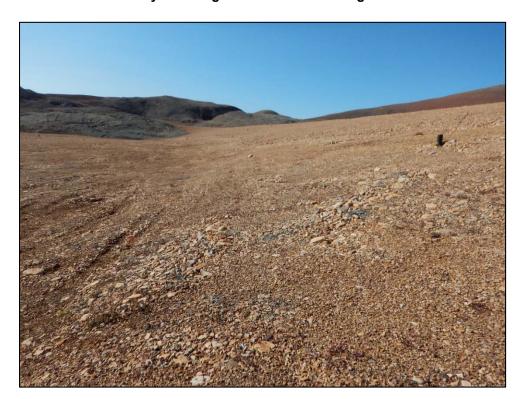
Toe of West Twin Dyke Tailings Cover – At the toe of the West Twin Dyke looking toward the right abutment.
